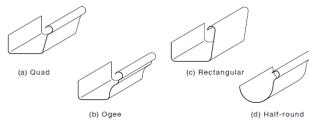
(A) TYPICAL EXTERNAL EAVES GUTTERS
